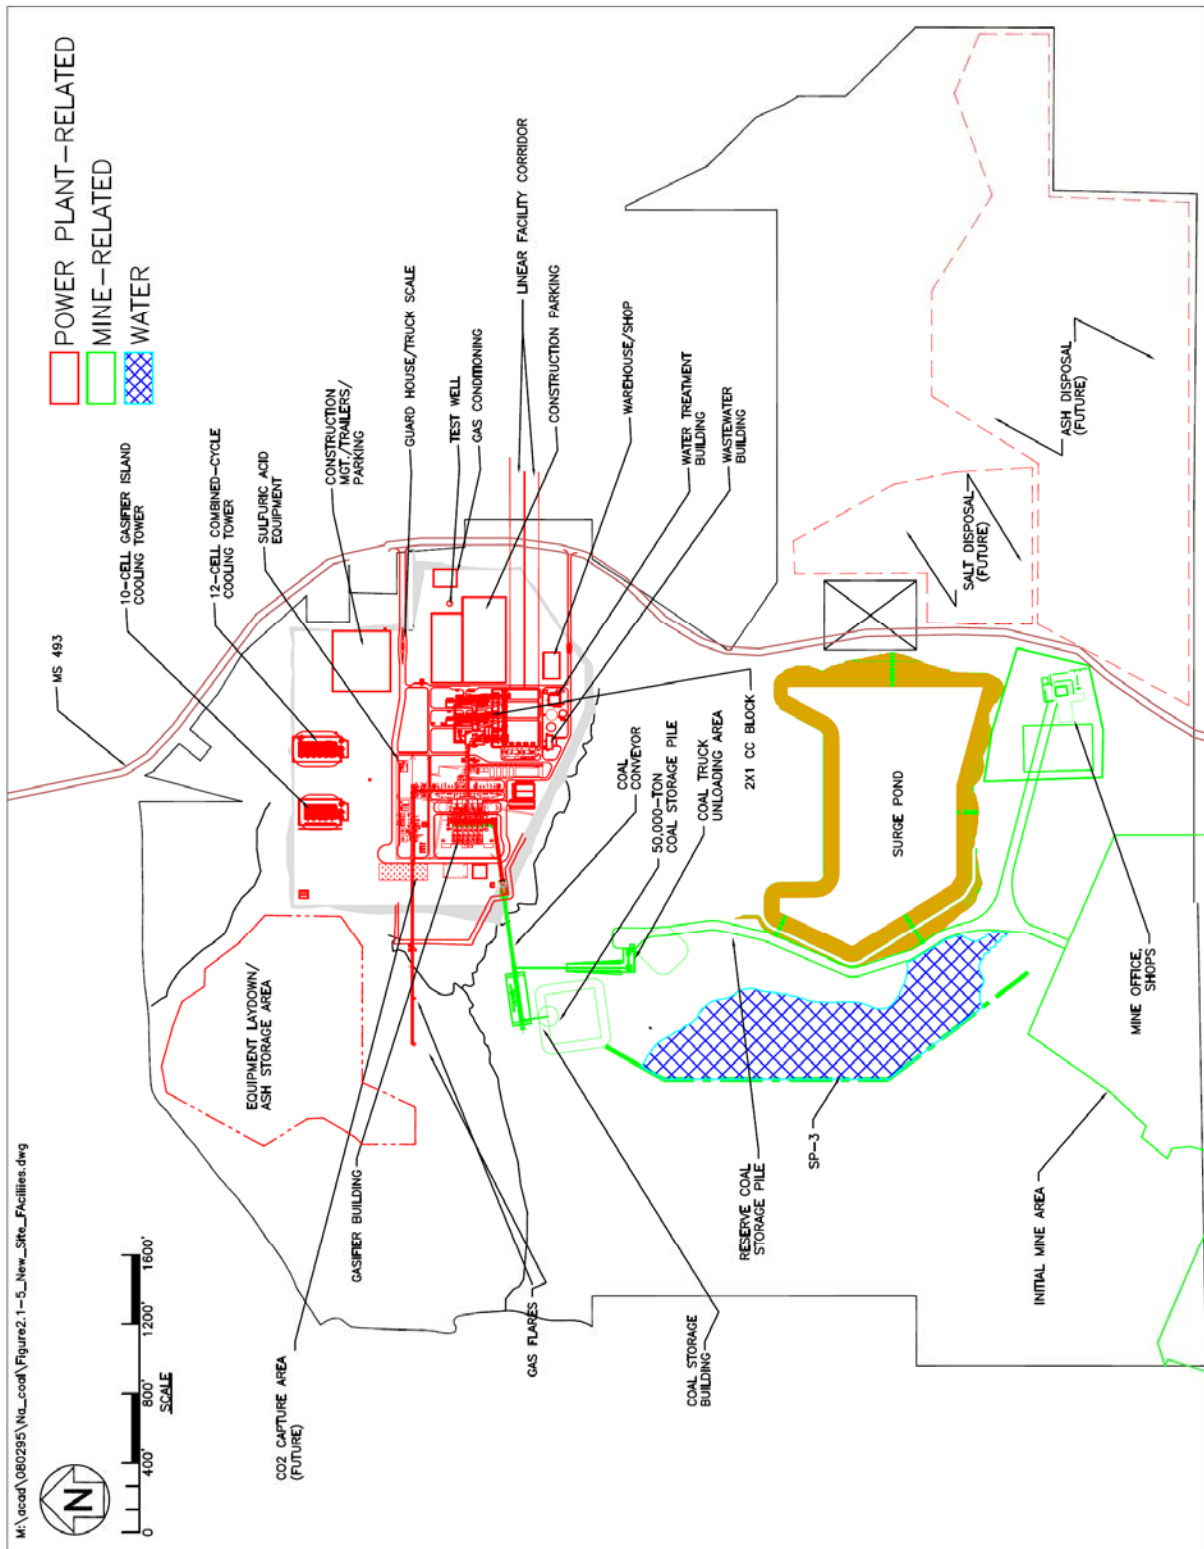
Planned Arrangement of Equipment and Facilities on the Kemper County IGCC Project Site
